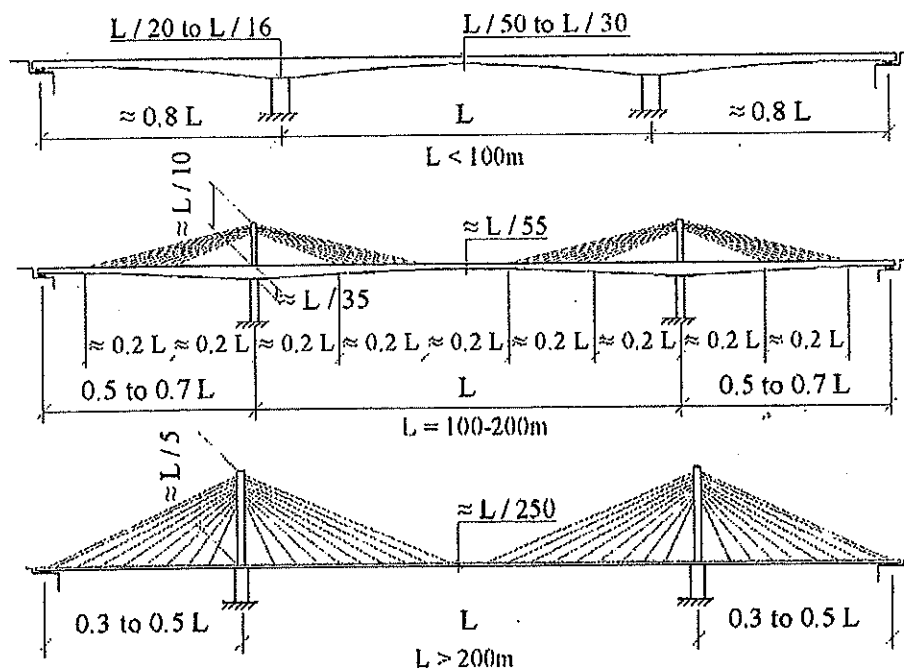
Common configurations of prestressed box girder, extradosed bridges and cable-stayed
